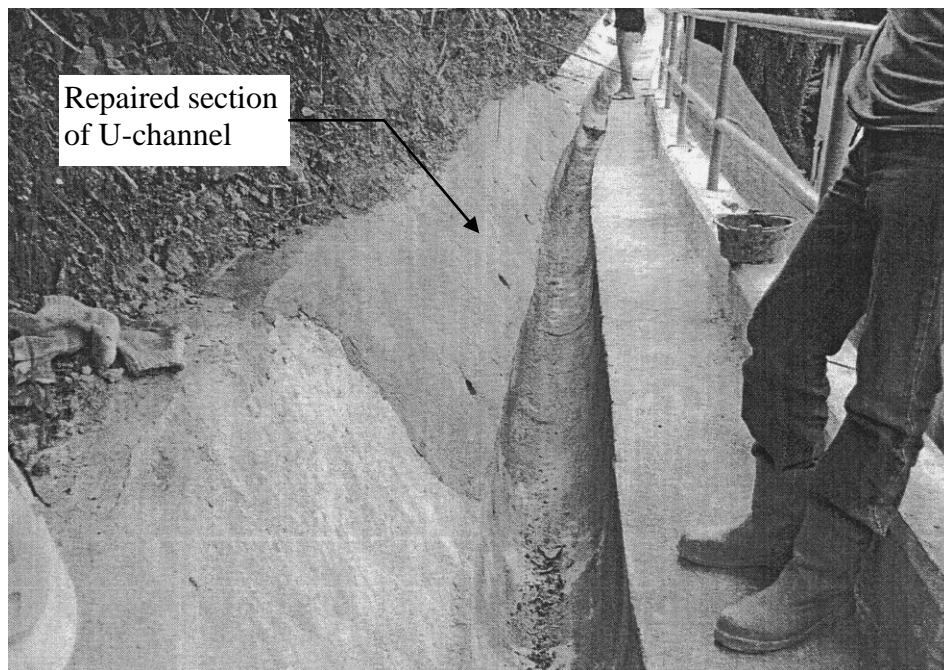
Repair of Cracked U-channel along the Crest of Slope No. 6NE-B/C44 Looking West
